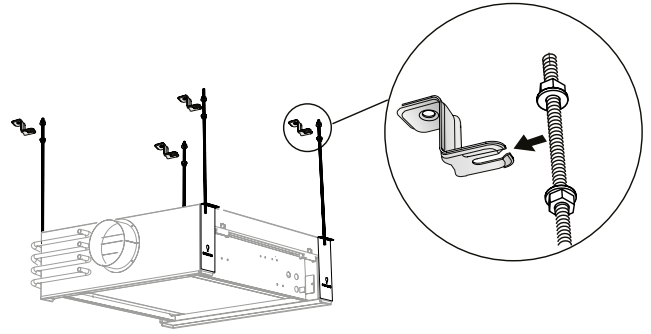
Suspension. No extra assembly parts are required for surface mounting. For suspended installation use SYST MS M8 which are ordered separately.
